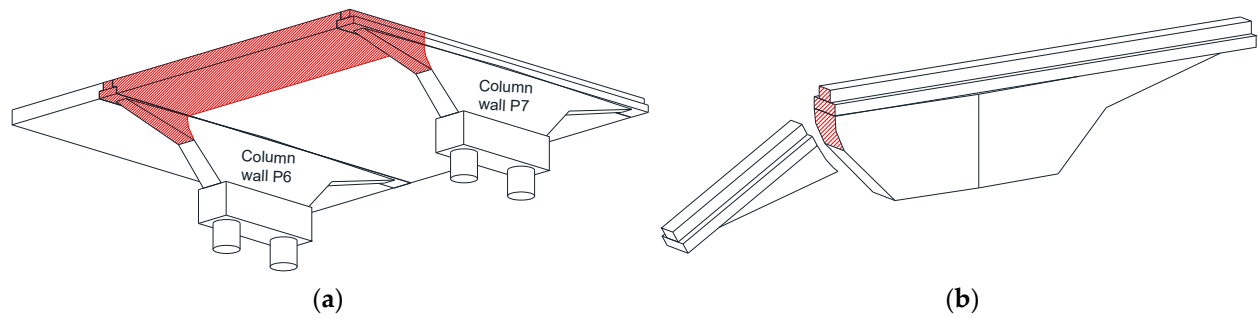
(a) View of the deck section that collapsed (in red); (b) indication of the plane of failure of column wall P7 at the beginning of the cantilever extension (in red).
